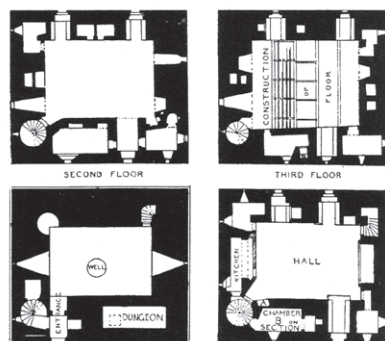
Comlongan Castle, Dumfriesshire. Plan.
